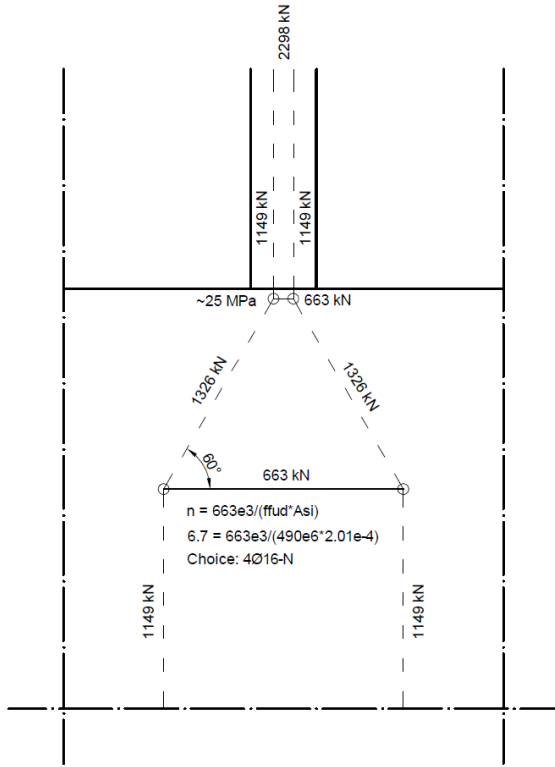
Strut and tie model for design of GFRP splitting reinforcement.
